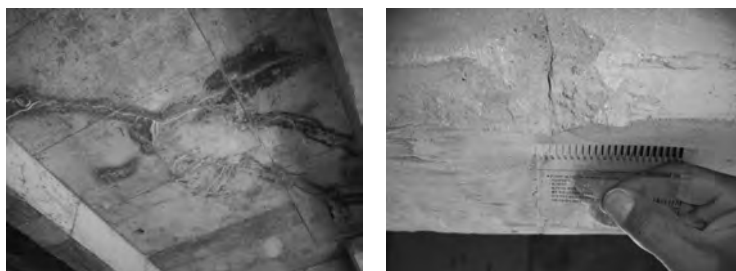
Cracks at the slab and beam in the existing structure
